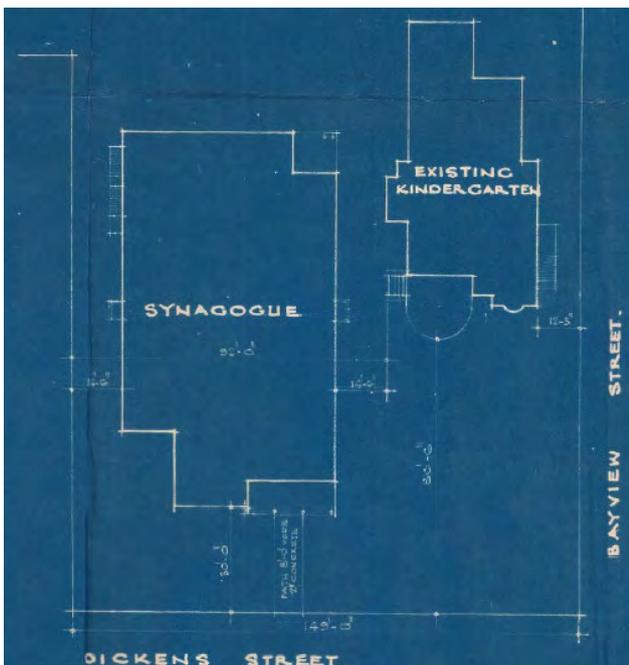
Building permit 2980 drawings (K Popper, undated). Site plan showing footprints of the kindergarten (former Allen residence) and the proposed new synagogue. Dickens Street is at the bottom. (Source: Council Building File)
